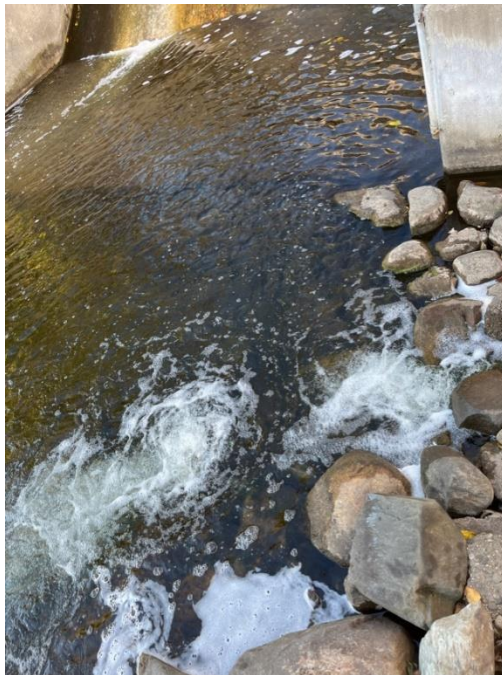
Cold water outlet pipe appears to have compromised joints. Water was observed bubbling up to the surface along the pipe.
